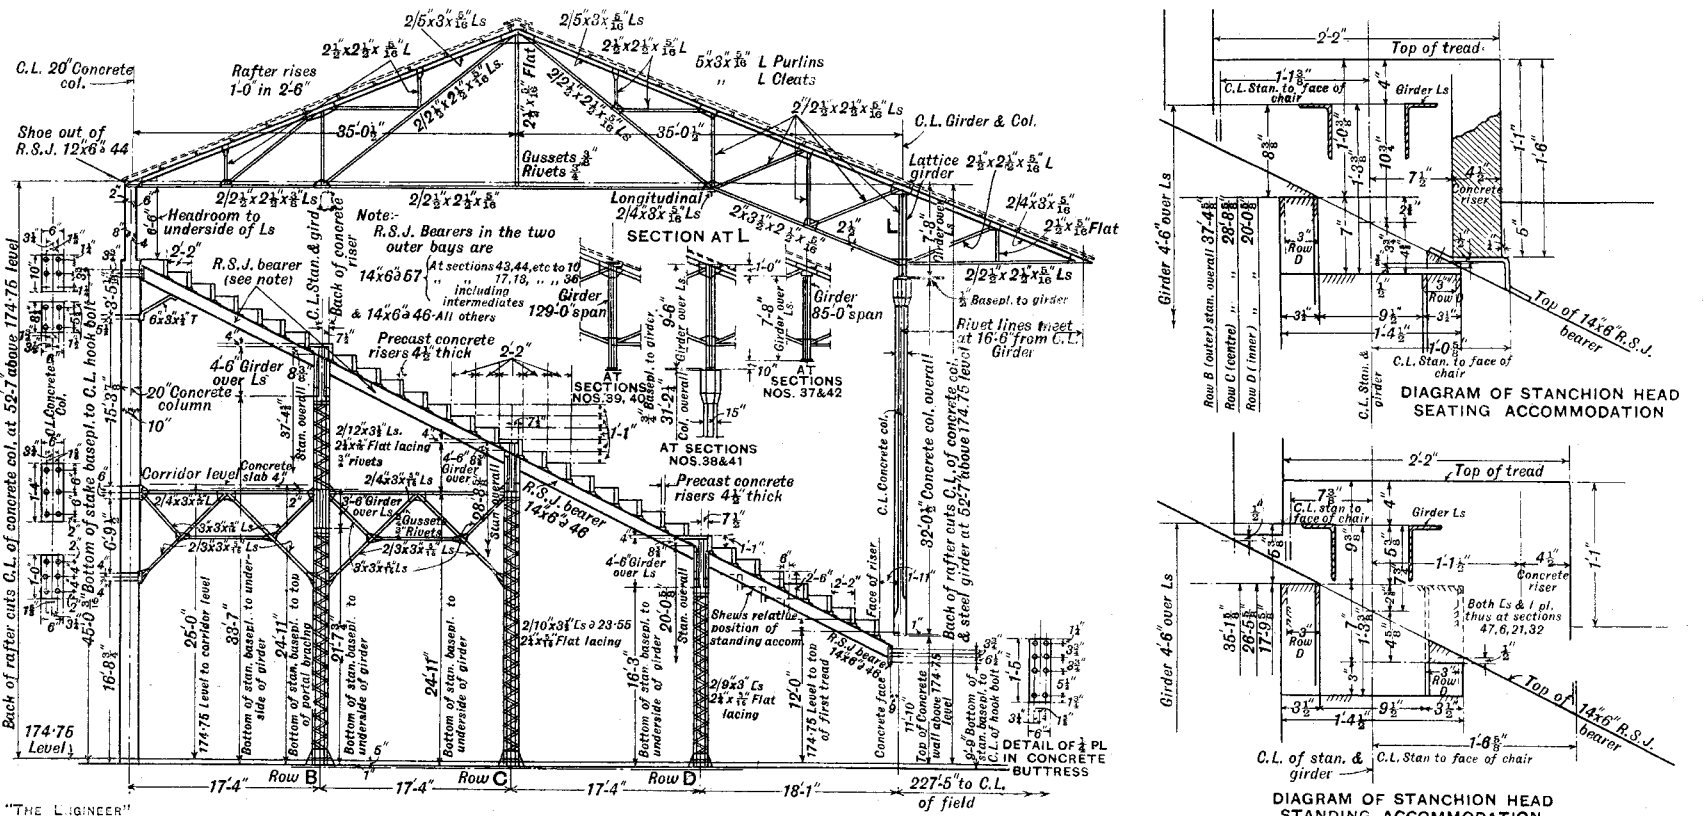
ARRANGEMENT OF ROOF, TIERS OF STEPS, AND STEEL WORK
